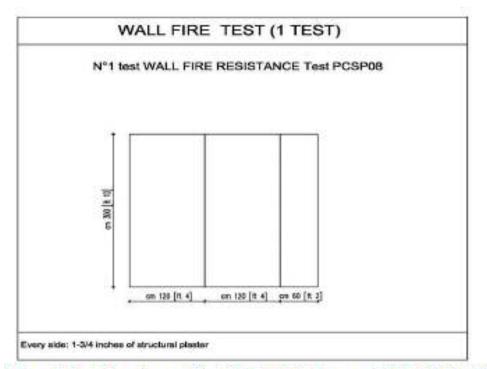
Panel Dimensions and Size of Schnell Wire Systems, s.r.I. ASTM E119 Test Wall Assembly
